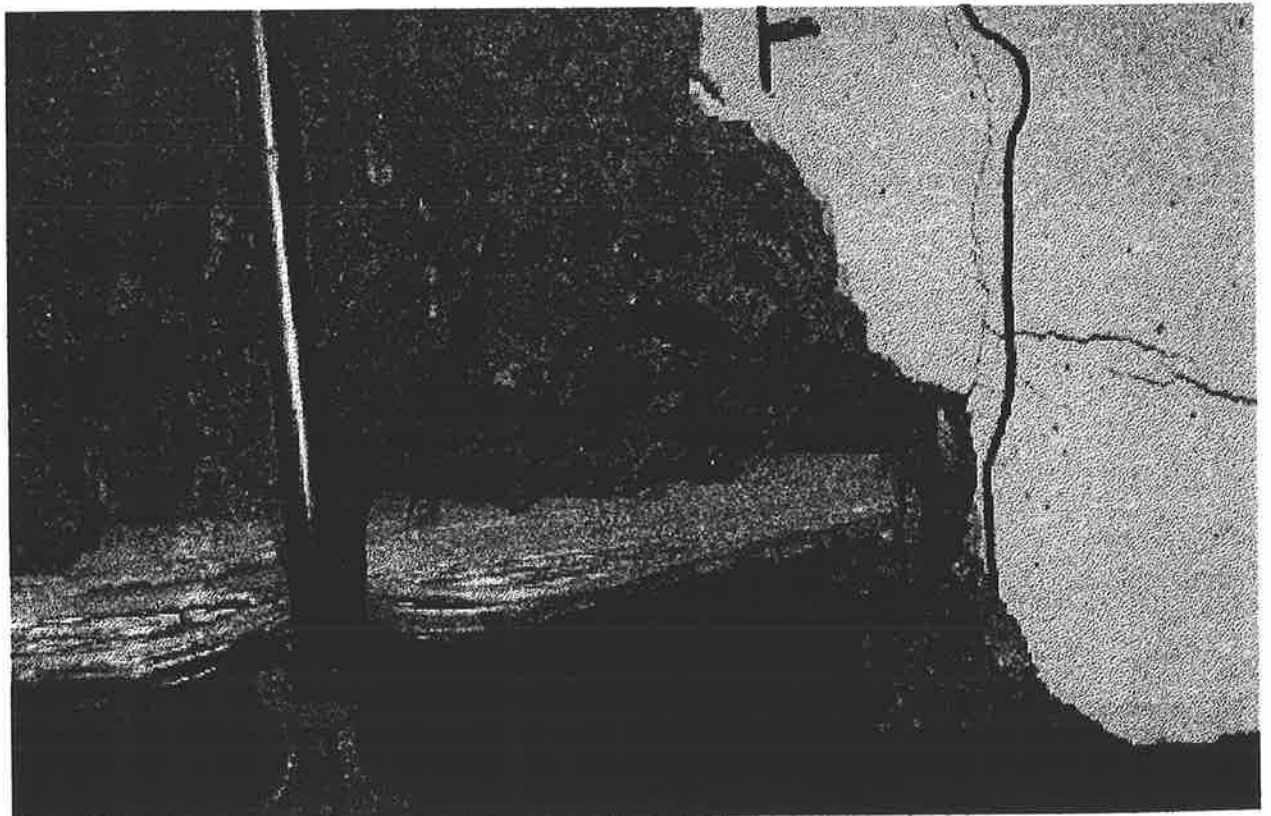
FRP rebars at the bottom of beam 2 after failure.
